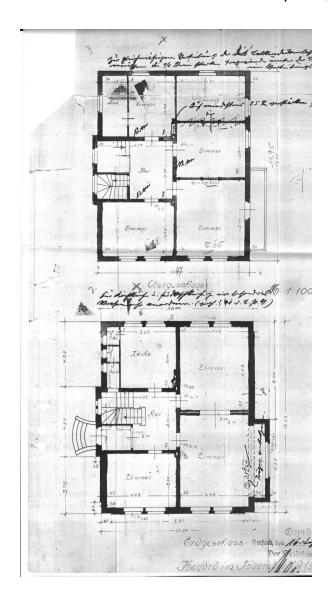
Part of the house and lot plan Gustav submitted in 1919
